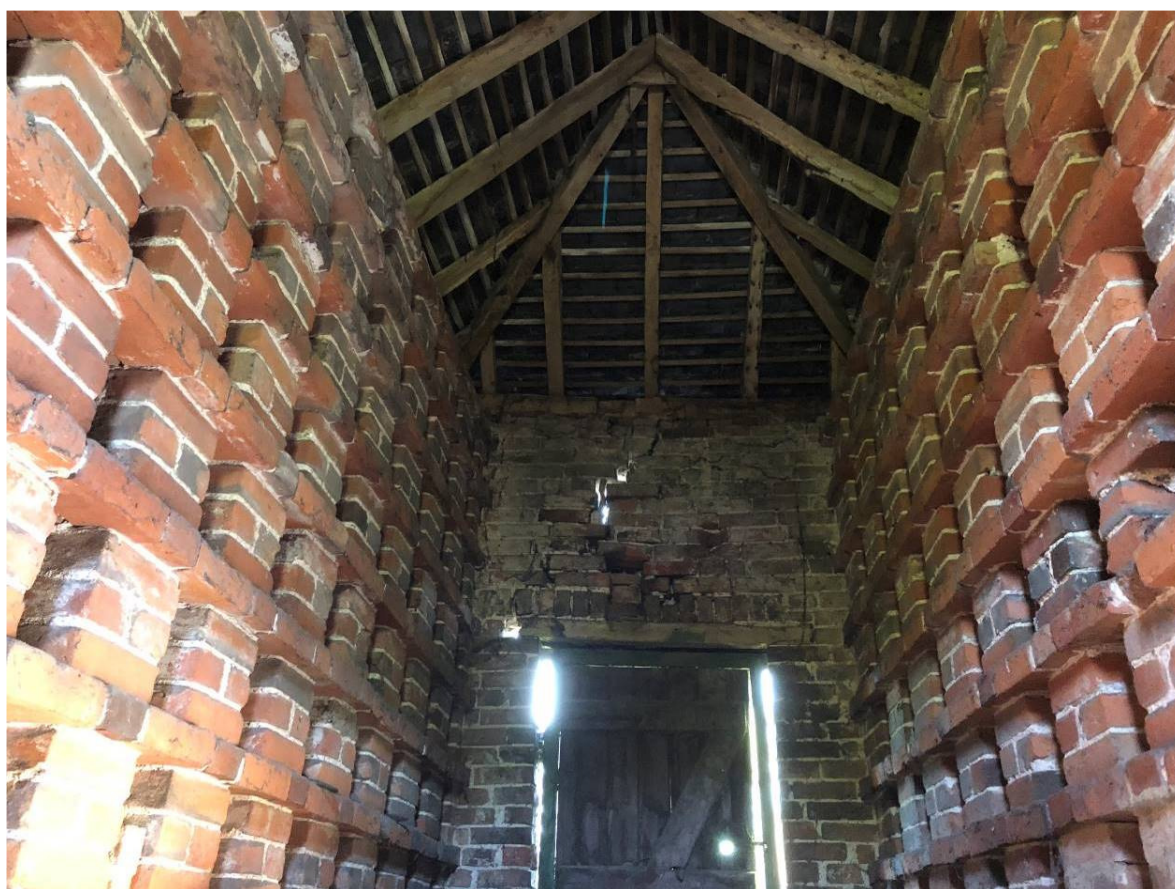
Interior of dovecote [2] looking south showing nesting boxes and projecting ledges to east and west walls (image: SEL).
